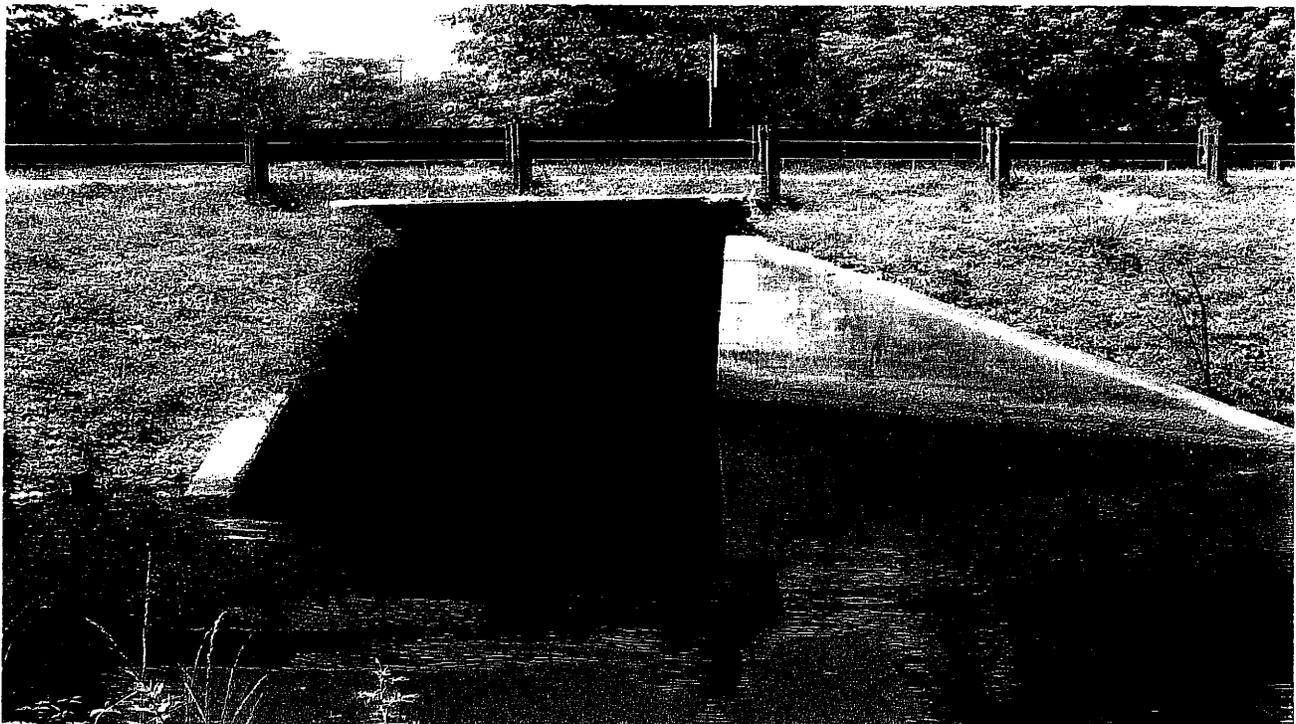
Open space at proposed Food Lion retail plaza on US-158
